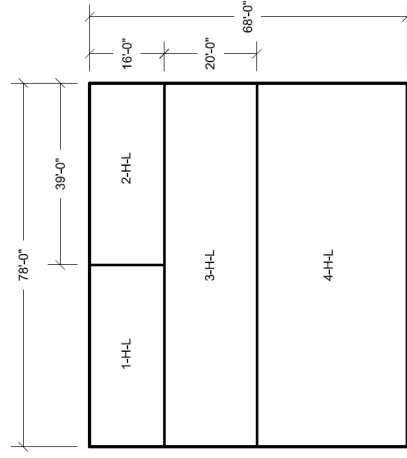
H.6-58: PUMP HOUSE EAST WALL LOOKING WEST
